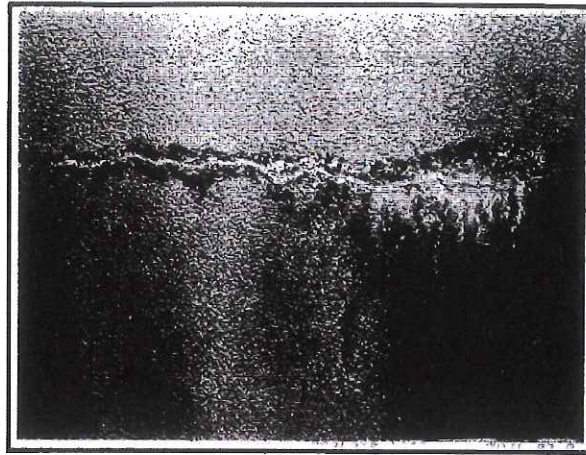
Minor longitudinal crack with efflorescence.
